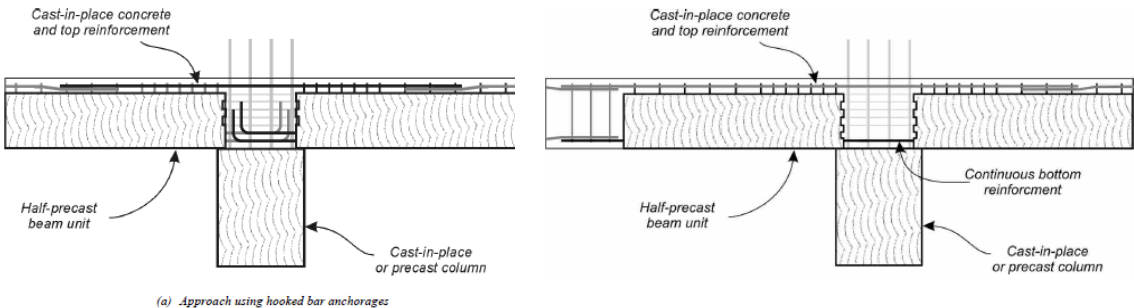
Type of wet connections of precast structures, equivalent to cast in situ connections (fib bulletin 27, 2003)
